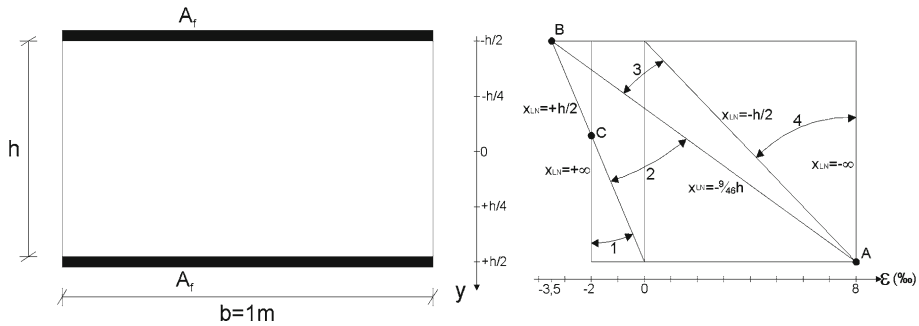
Design zones covering all conventional failure strain diagrams. Failure Mode—Masonry crushing: Zone 1—Fully compressed cross section; Zone 2—Partially compressed cross section; Failure Mode—GFRP tensile fracture or debonding: Zone 3—Partially compressed cross section; Zone 4—Fully tensioned cross section
